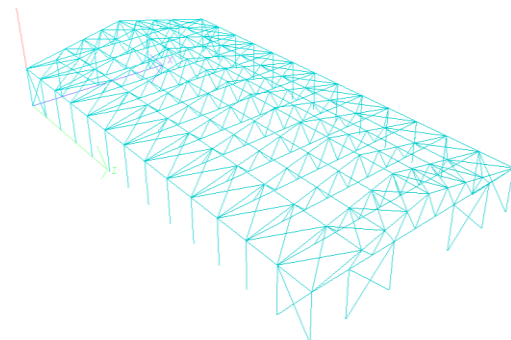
3D Model of Truss Arrangement Configuration(40x80m)
